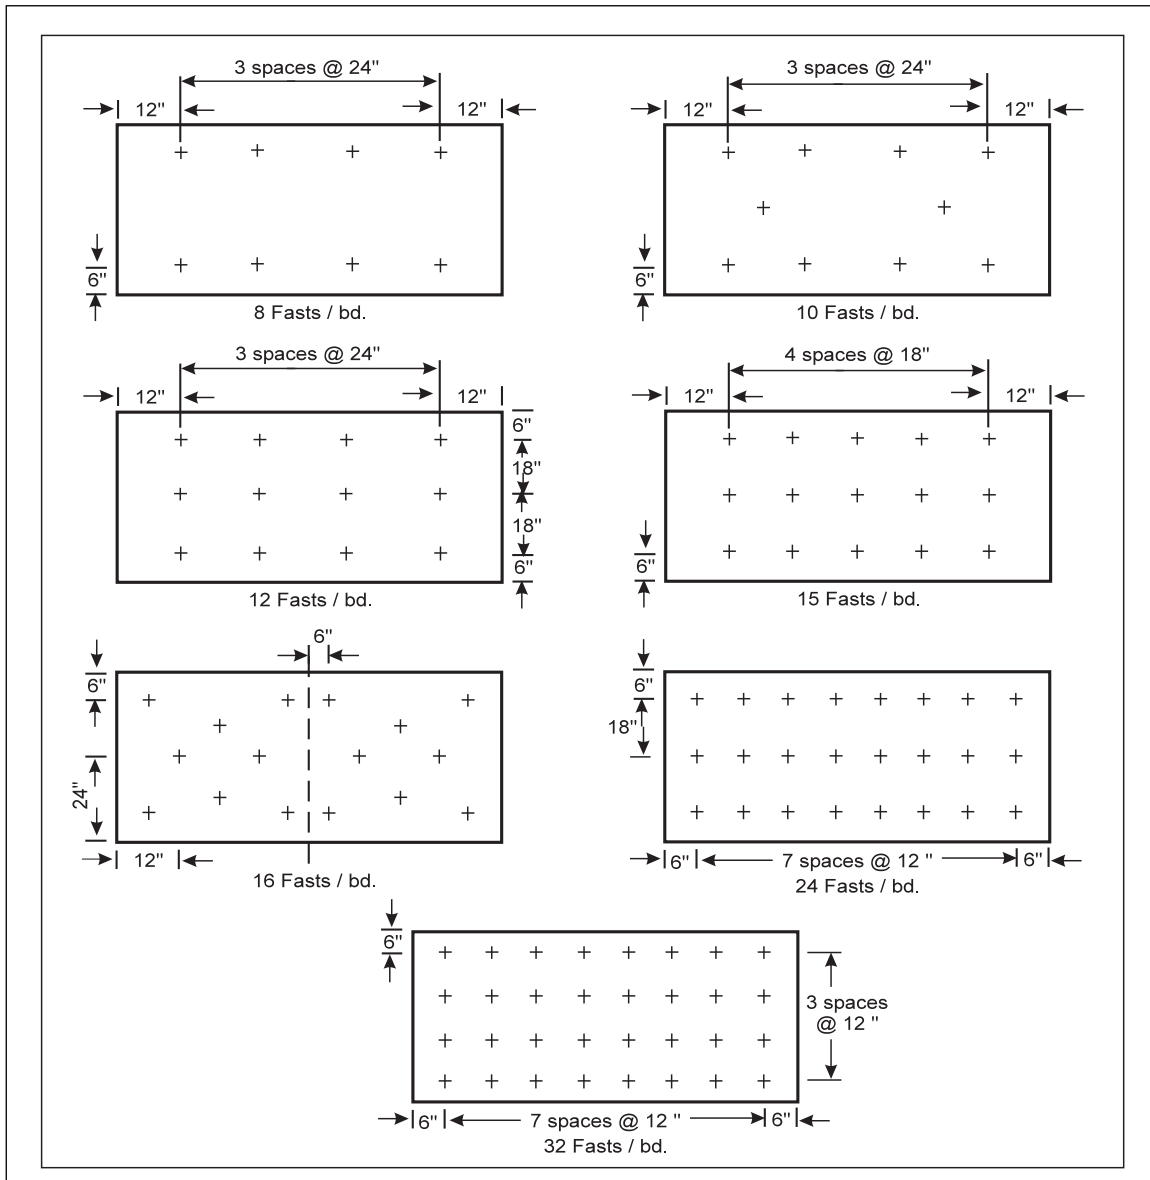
Fastener placement 4 x 8 ft (1.2 x 2.4 m) boards used on steel decks with a 6 in. (150 mm) module or rib spacing
